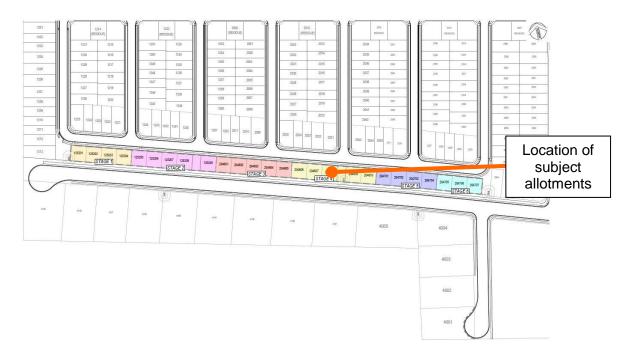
Site Plan by Cardno, Project - Chapman Street Werrington, Smart Lots, Subdivision Plan, Stage 01, Drawing No. 80219053-004-SK001, Revision 1, Dated 03/04/2020
